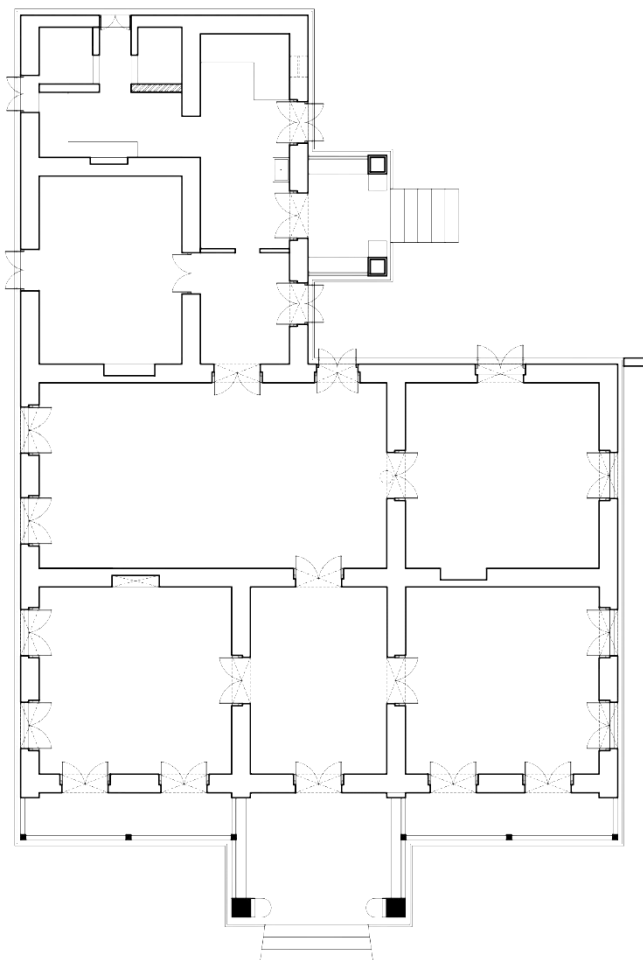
Noronha House Plan, 1990s | Credits @ Author
